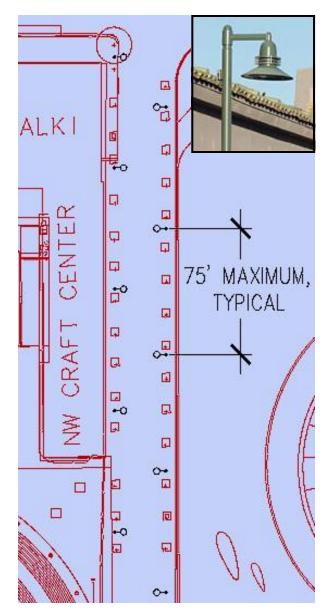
Typical pole layout and spacing for Option 1. Also shown is and example of a typical new proposed pedestrian post-top fixture.
